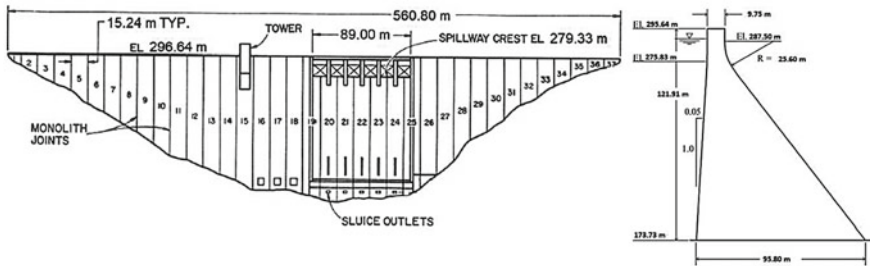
Downstream view of Pine Flat Dam and cross-section of monolith no. 16
